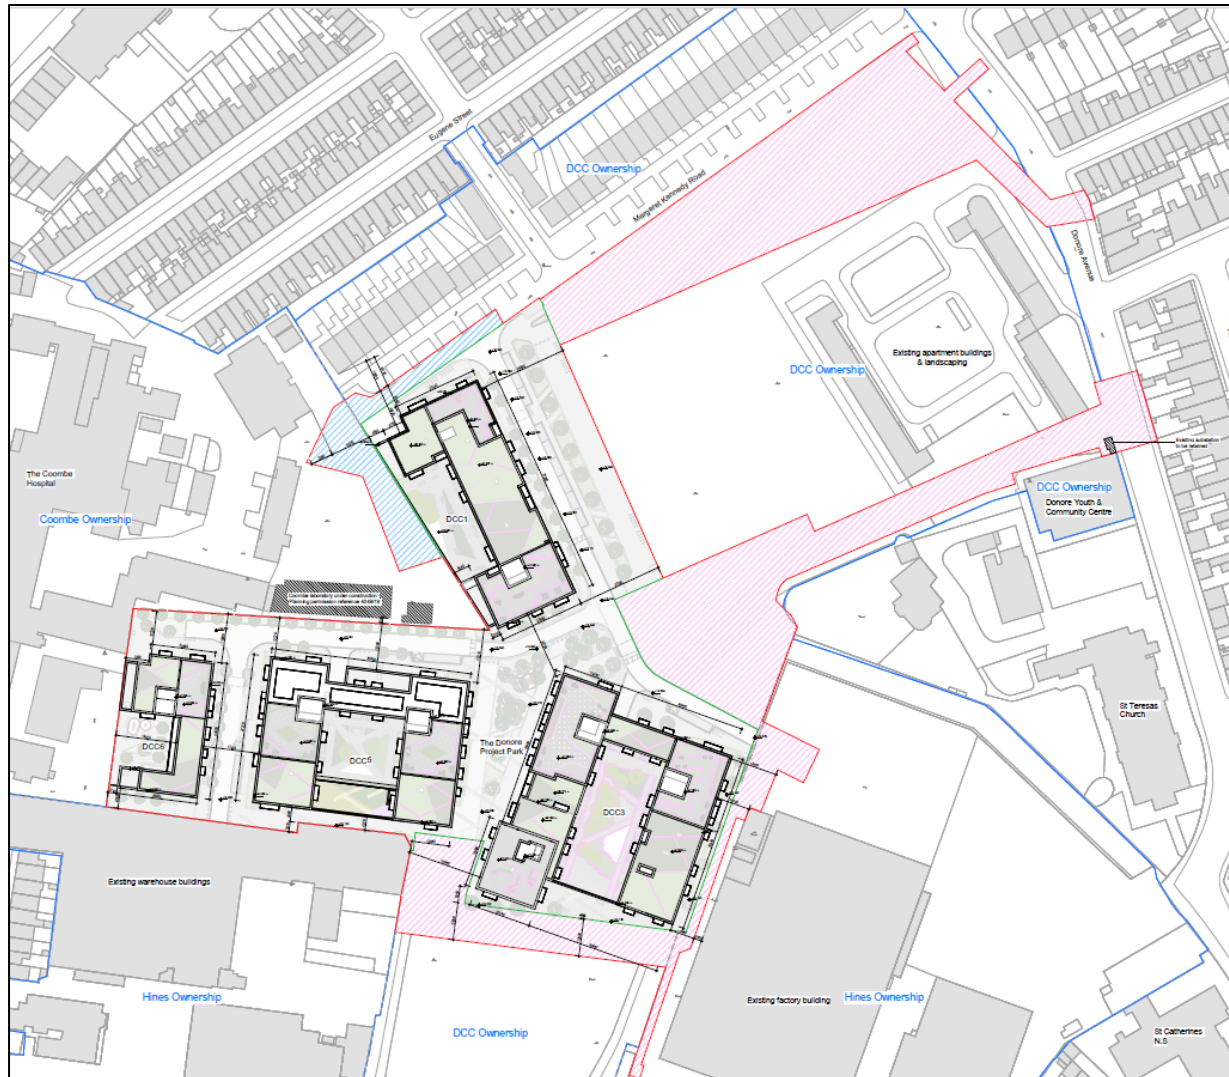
Proposed Site Layout (refer to DWG No.: STG-MW-S1b-00-XX-DR-A-1100002-S4-P1, Metropolitan Workshop Ltd, September, 2022)
